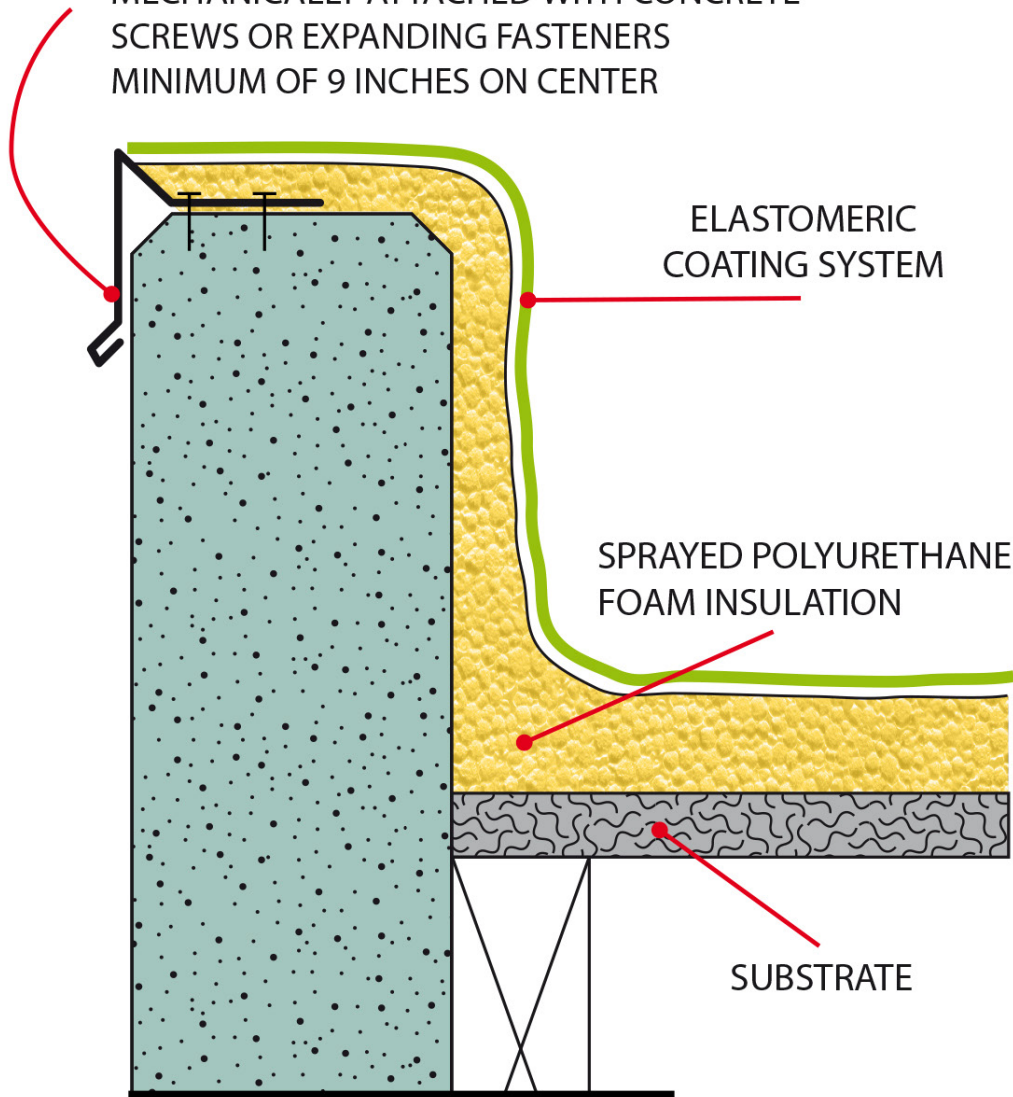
, PARAPET WALL / COUNTERFLASHING
